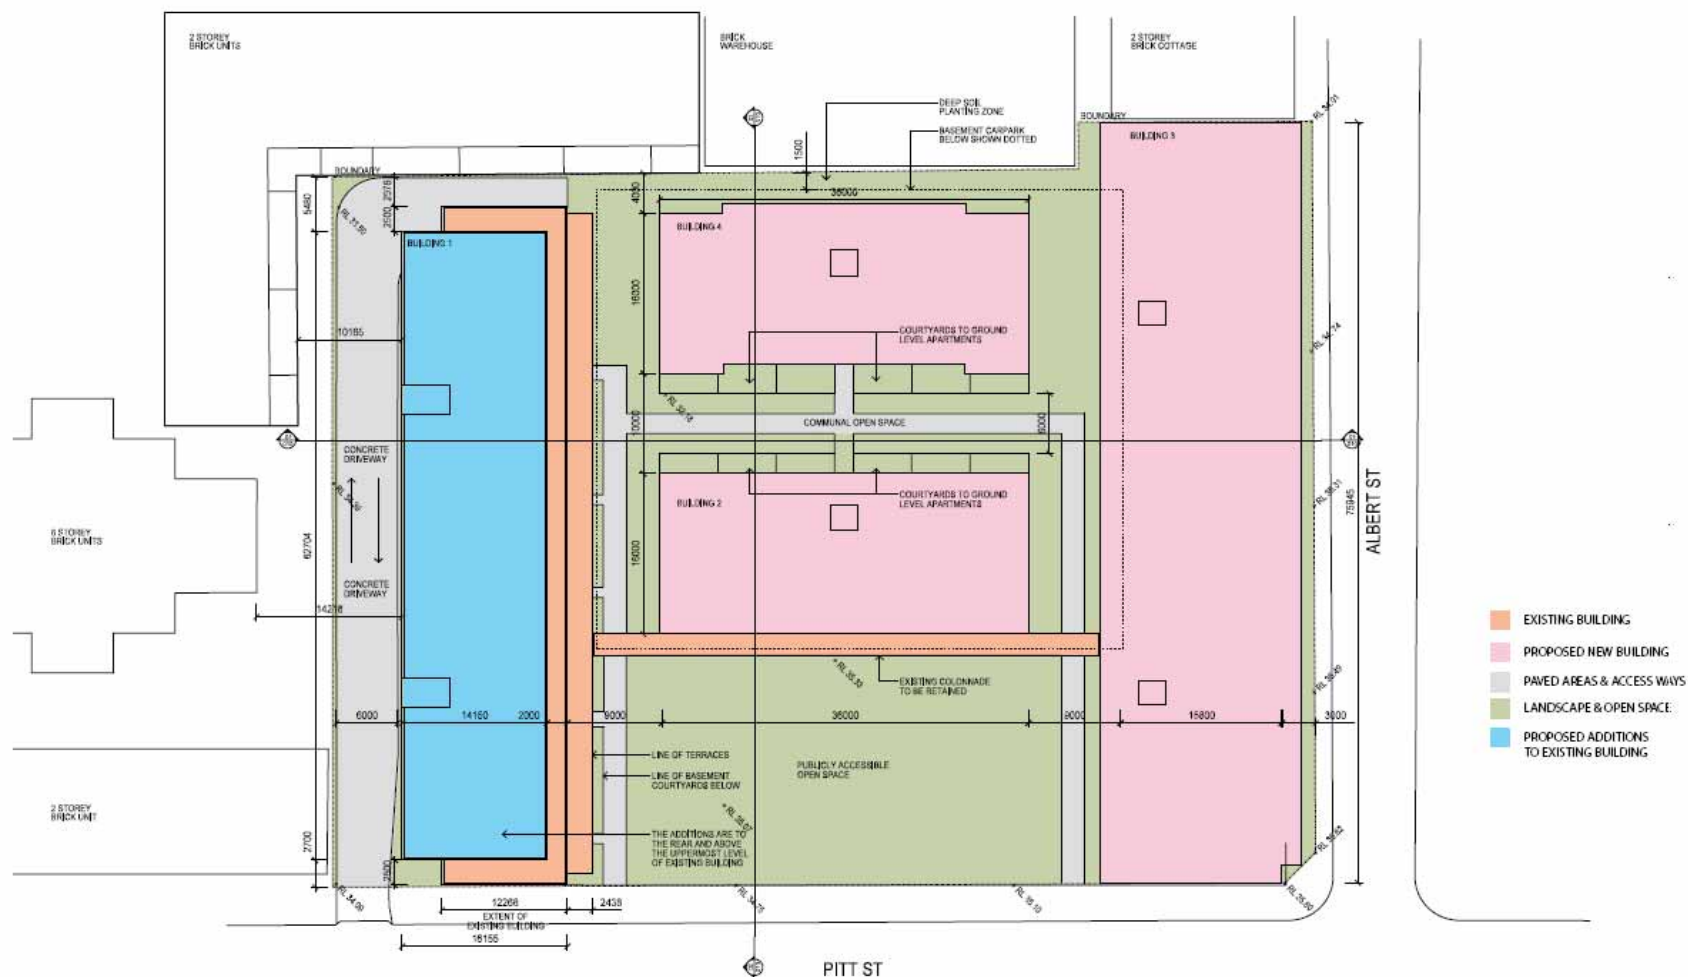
Proposed development layout, indicating proposed location, orientation and setbacks of building forms
